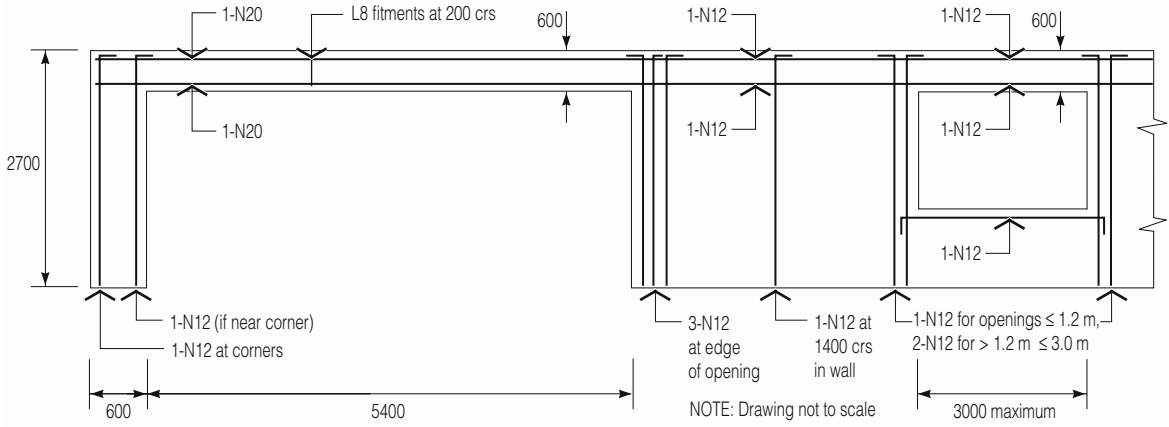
Wall Reinforcement for 140-mm Leaf for Wind Classifications N4 and C1 and 2700-mm Wall Height
